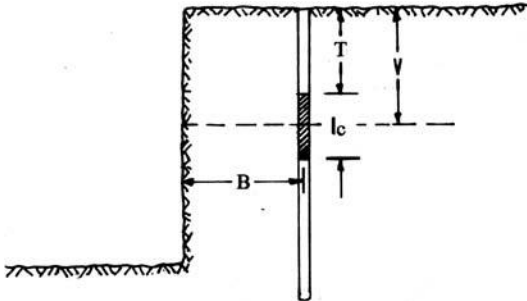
Section view showing a short cylindrical charge located at the hole collar.
